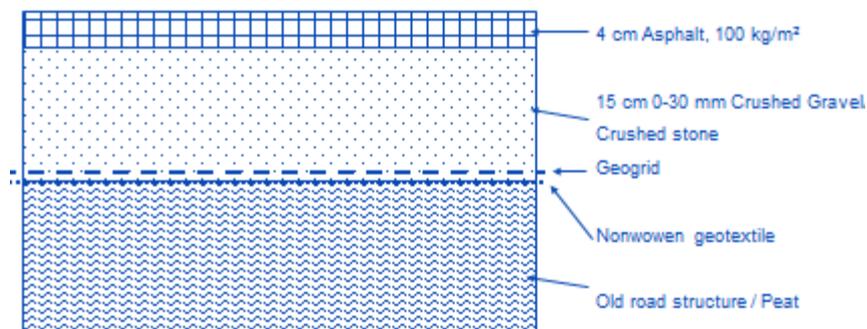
Structural layout of test road at Hitra (Watn & Øiseth)
